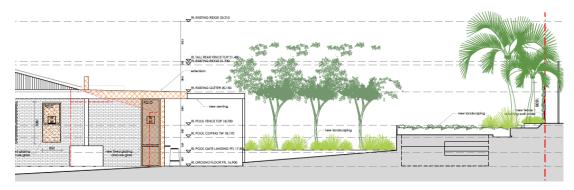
Proposed eastern elevation showing landscaping in rear yard (Noble Architecture)
